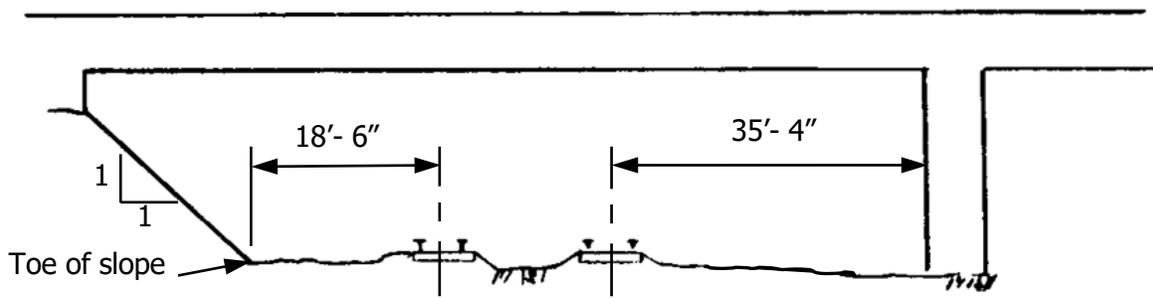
Bridge elevation view indicating horizontal offset for two railroad tracks below the bridge.
